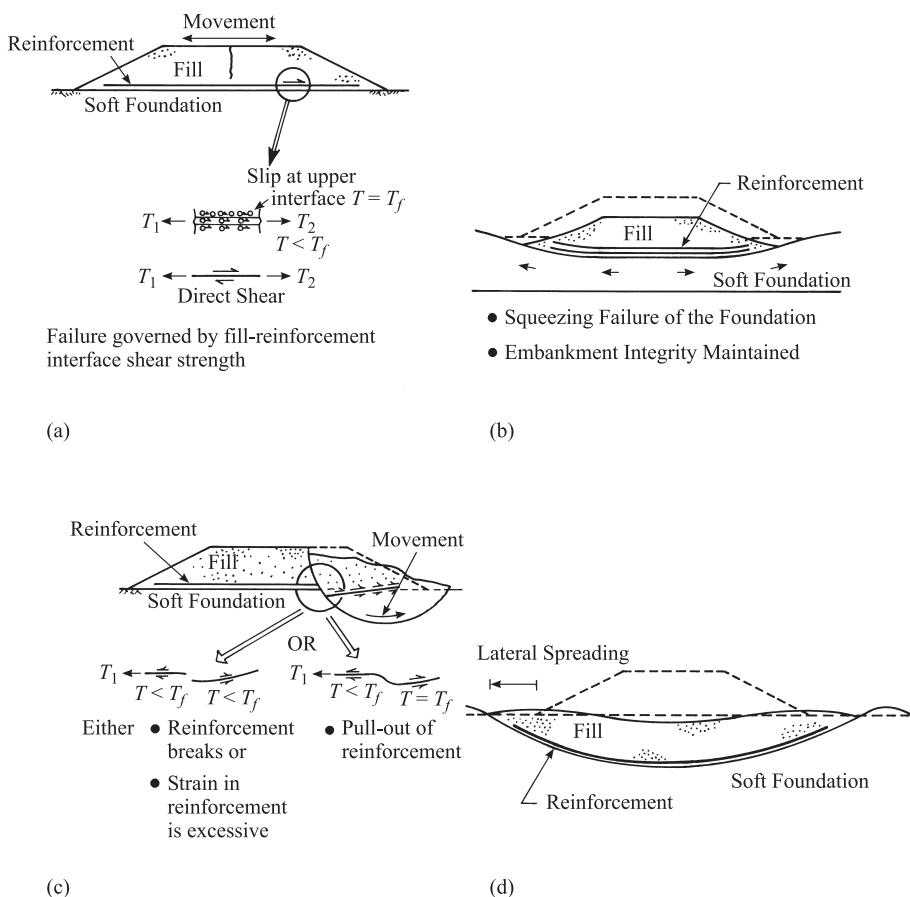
Failure mechanisms of reinforced embankments on soft clay (Rowe 1996). a) Embankment splitting foundation, b) Extrusion of soft material, c) Rotational foundation failure, d) Excessive displacement.
